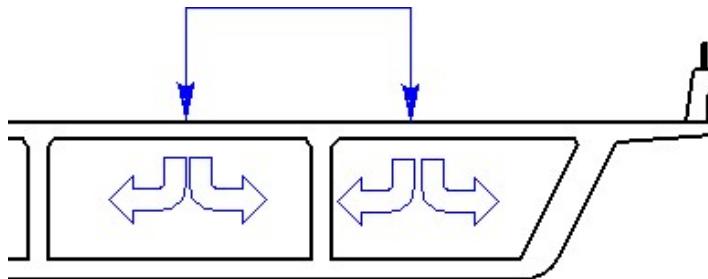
Truck Load Path from Deck Slab to Girders
